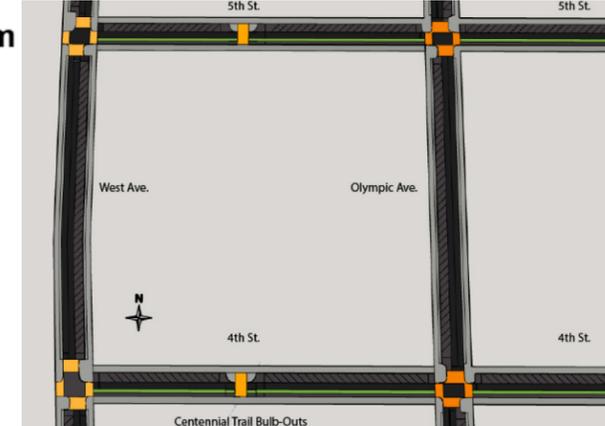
Sketchup model of 5th Street with a raised Centennial Trail bike crosswalk.
